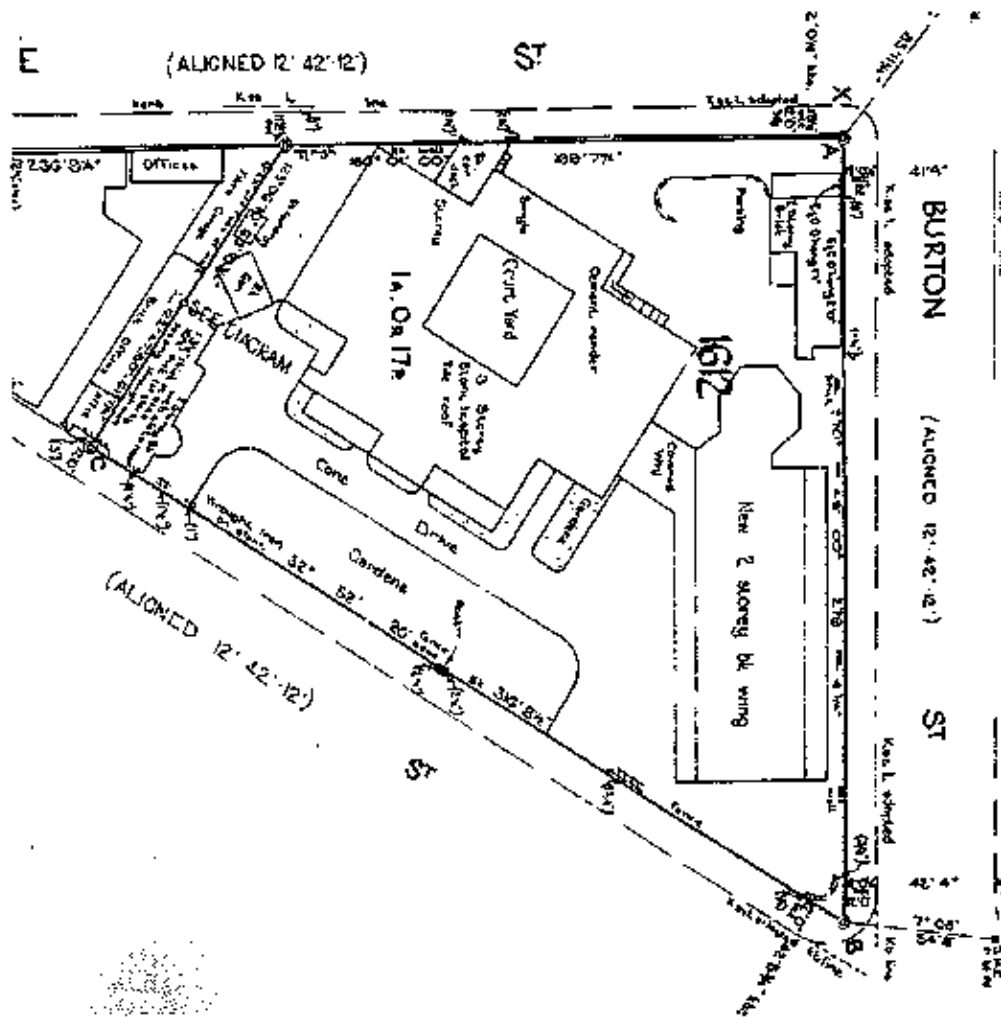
1966 Crown Plan showing the new layout of the Caritas Mental Health Facility.
